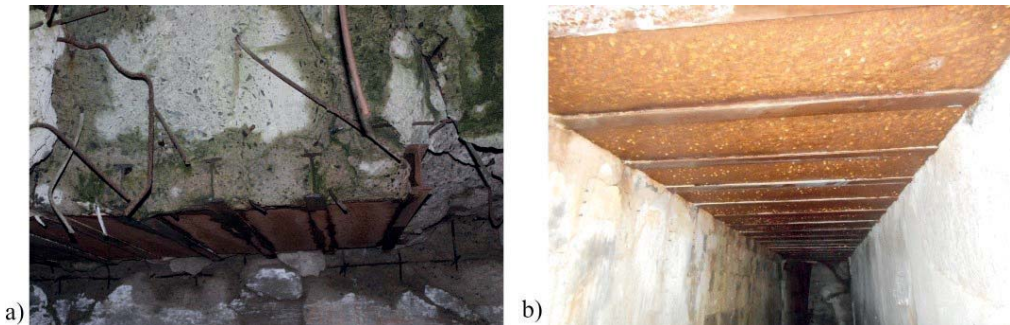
a) Composite slab on steel beams cross-section, b) the view of the slab in good condition (own photos)
